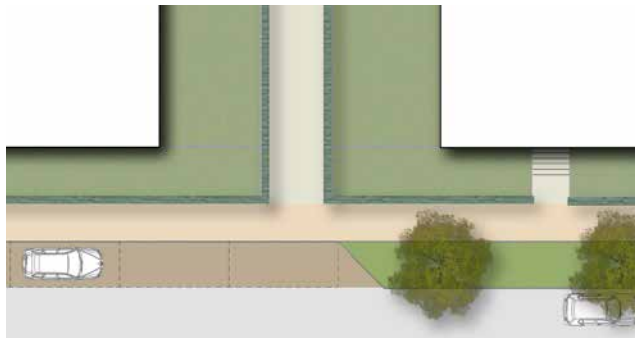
Illustrative diagram showing an indicative layout of on-street inset parking.
